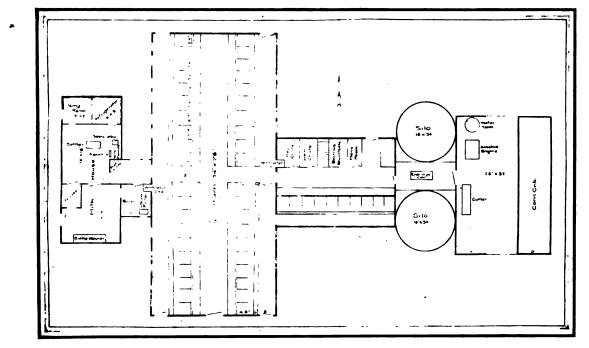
HILLCREST DAIRY BARN (FLOOR PLAN).
